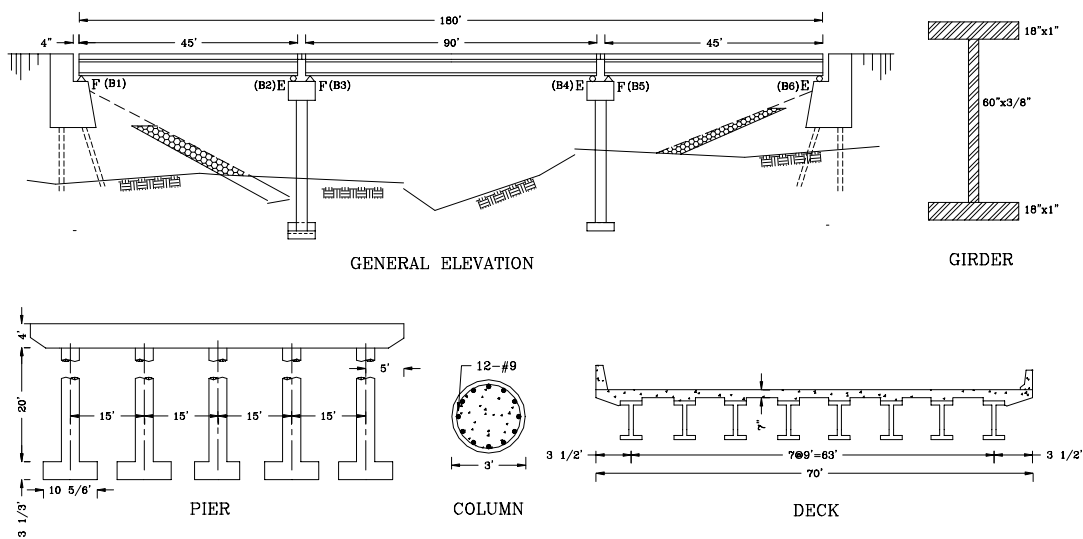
Typical Multi-Span Simply Supported Bridge with Steel Bearings.
